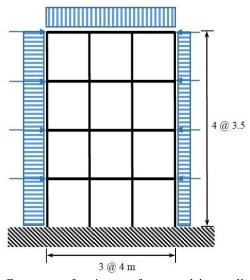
Geometry of a 4 story frame and its applied blast loads
